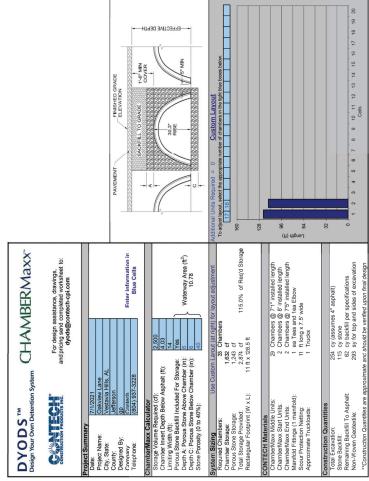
DETAILS AND SECTIONS VESTAVIA HILLS, ALABAMA
